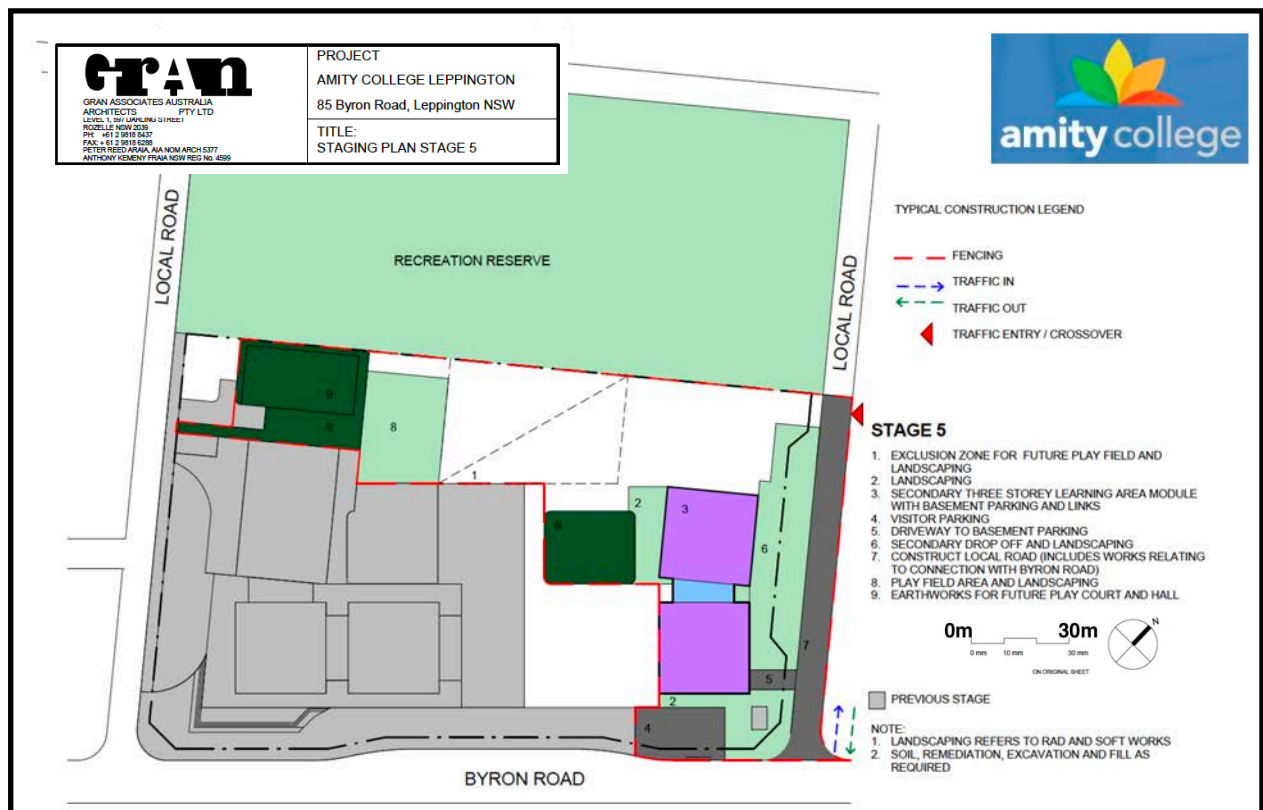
Proposed Stage 5 of Amity College school campus- Primary School additions, basement car parking and outdoor open space
